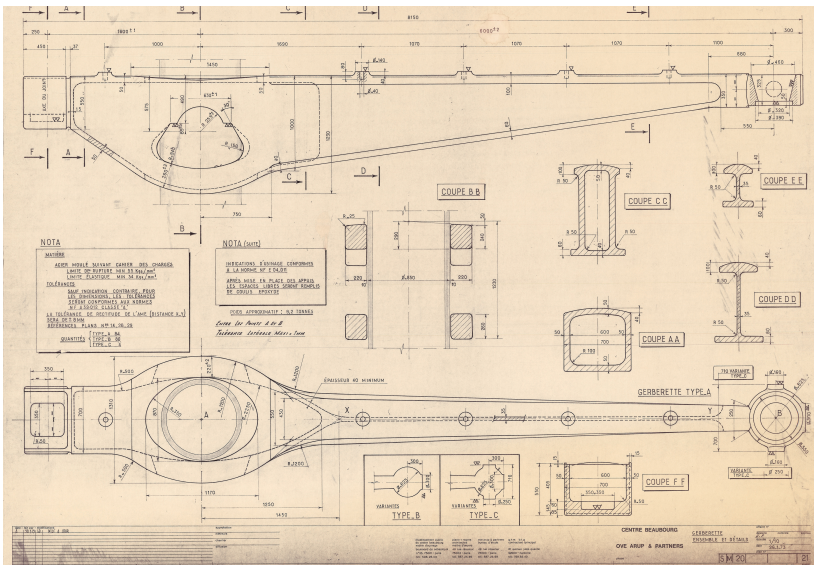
Drawing of the cast steel gerbrettes for the Centre Georges Pompidou Paris, France. Photo by courtesy of Fondazione Renzo Piano, for details see the figure credits list.
